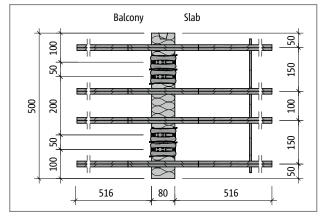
Schöck Isokorb® T type Q-E-VV5: Product layout
